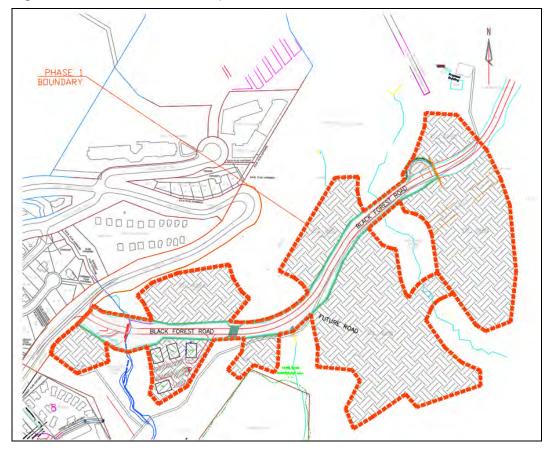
Black Forest Plan (Source: D.C Ponto design drawings)
